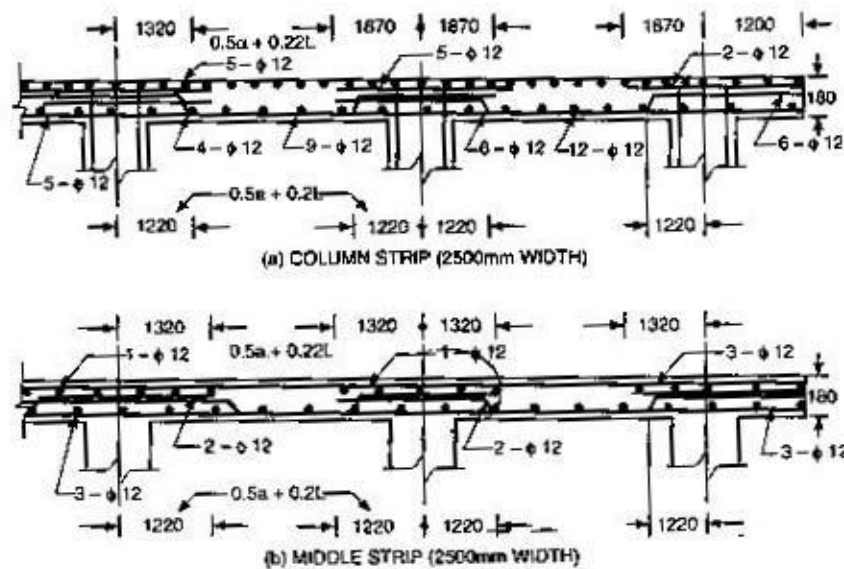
Reinforcement Details in Flat Slabs of Example 10.6.
